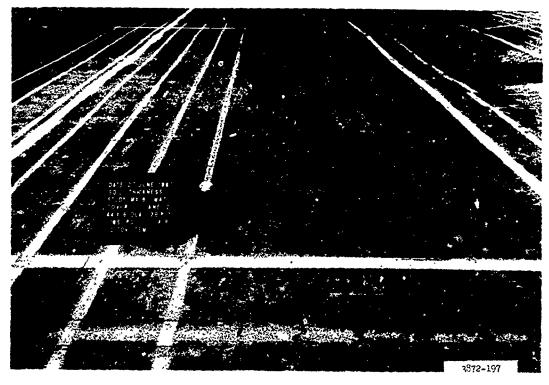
Test section II, lane 1, item 3, after failure at 202 coverages
